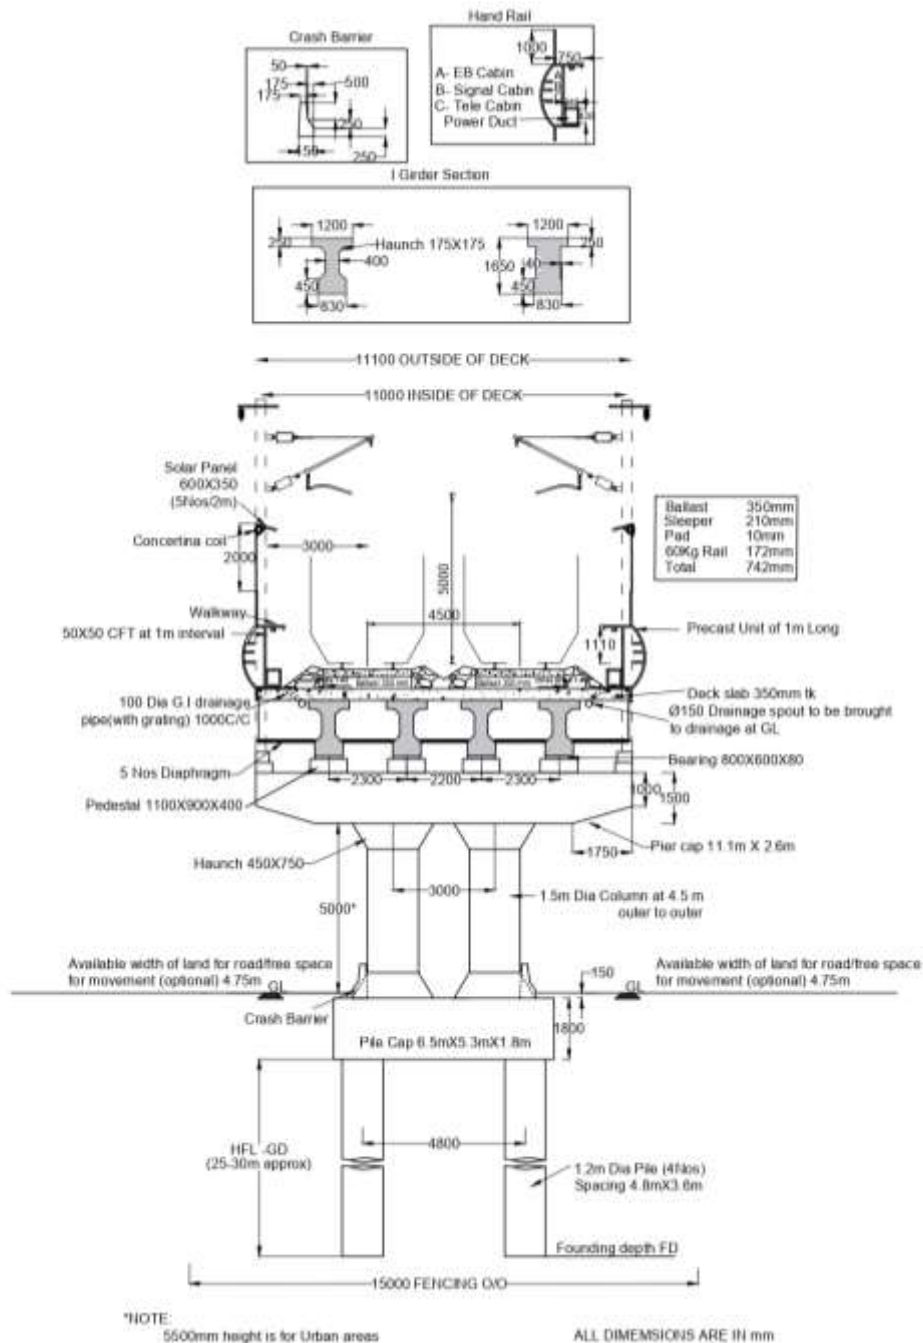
General Arrangement of Viaduct with I girder and 4 nos of piles -1.2m dia.
